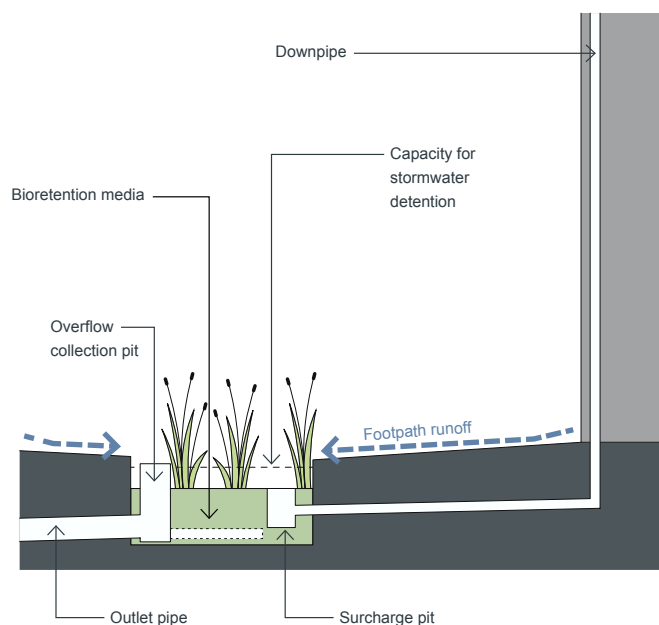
V.4 A bio-retention garden improves water quality by using plants to treat roof and surface water runoff
